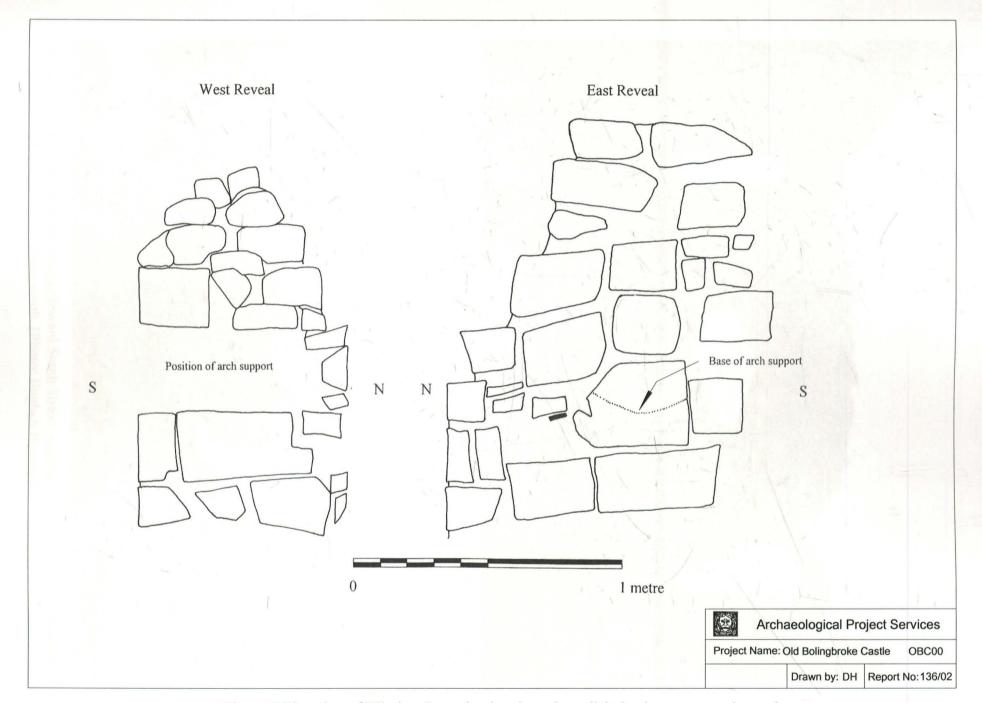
Elevation of Window Reveals. showing where dislodged stones were located
